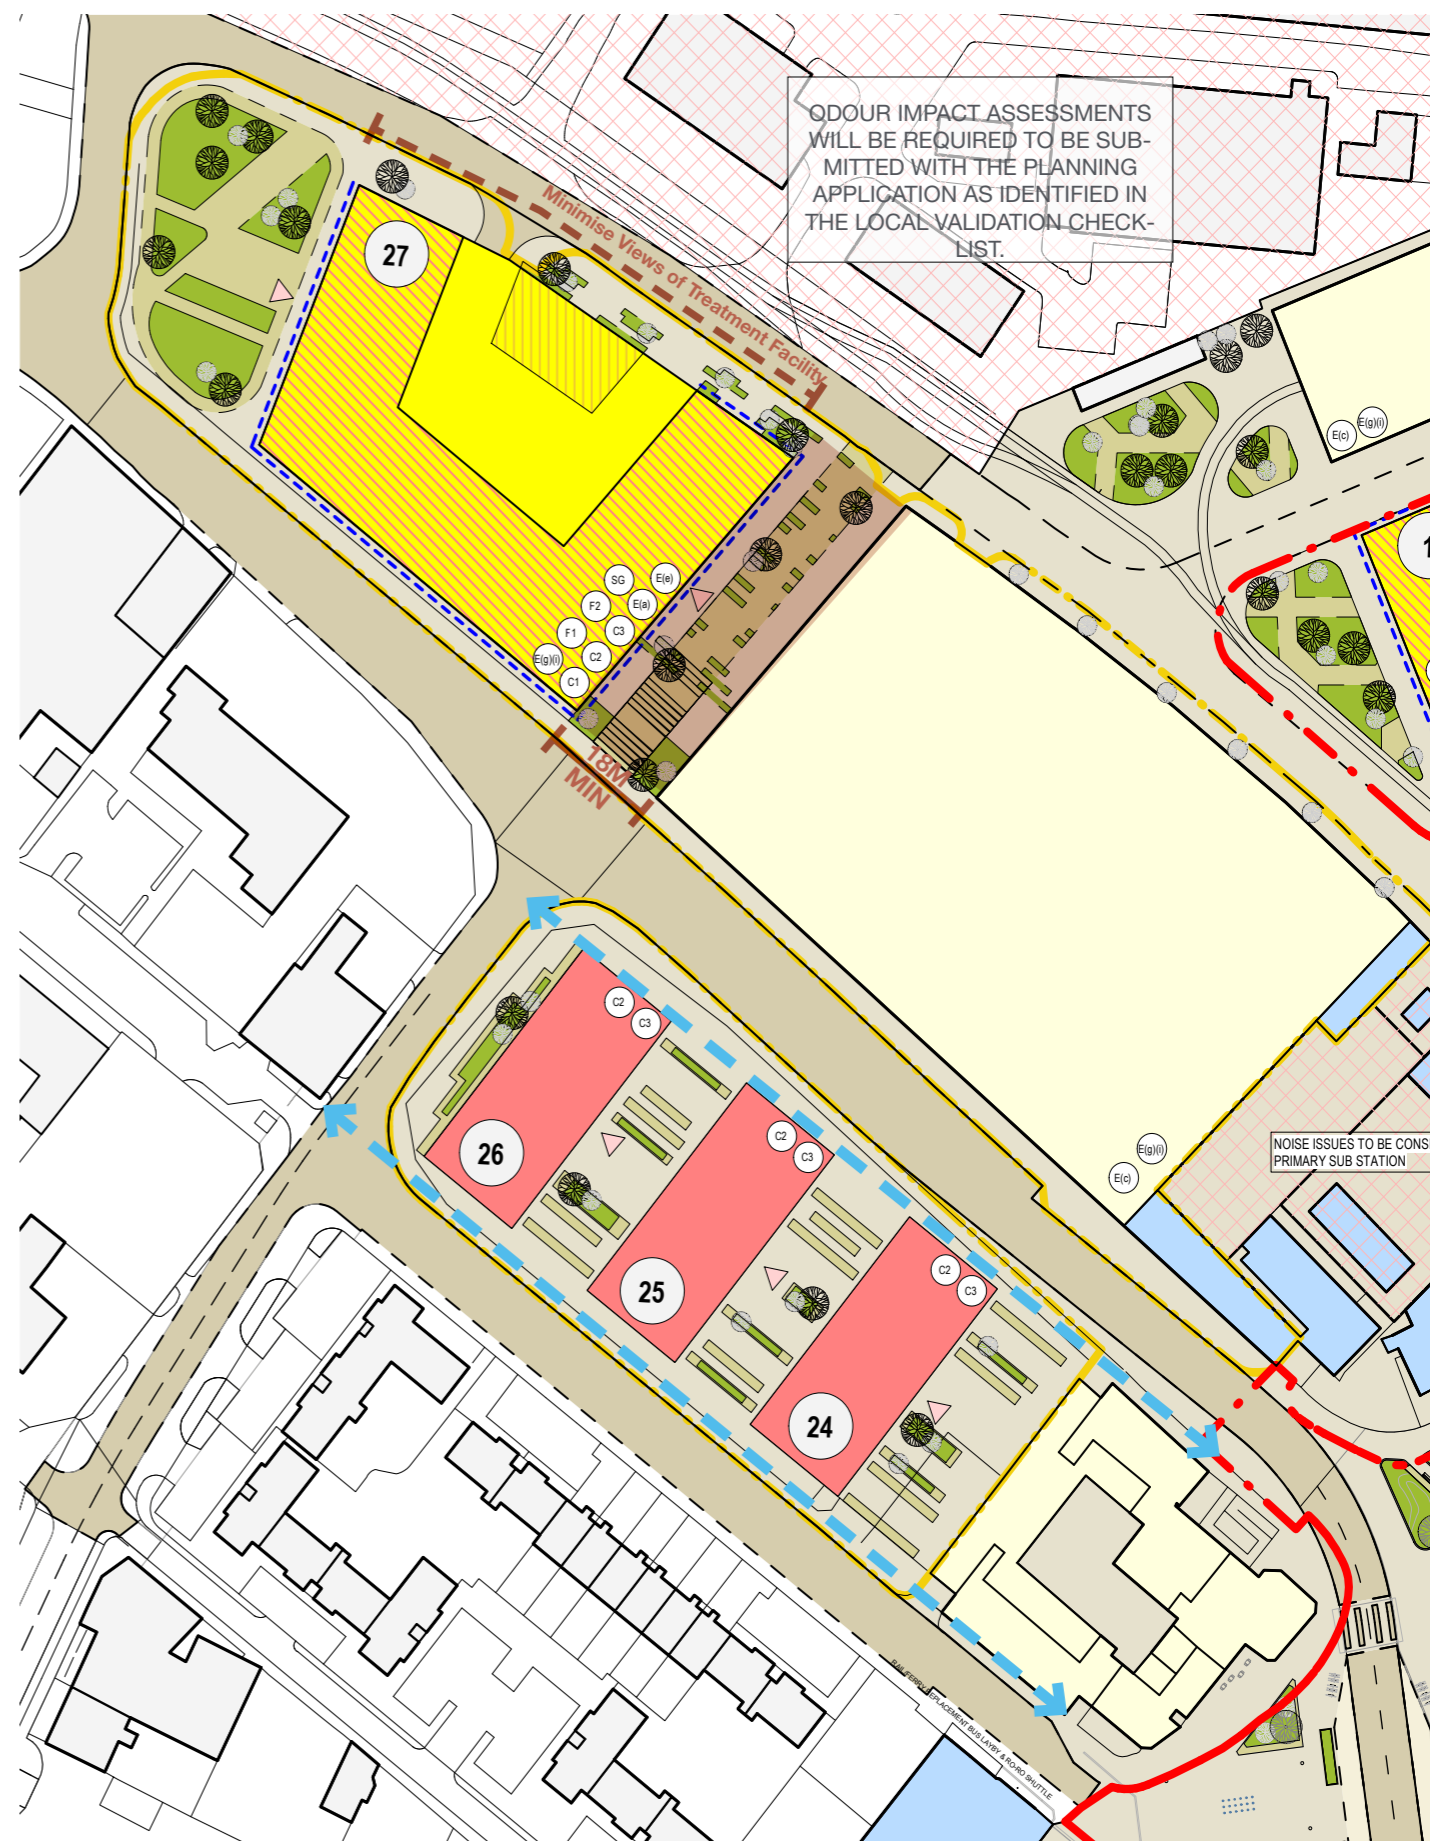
Illustrative Masterplan Parameter Land use Plan
